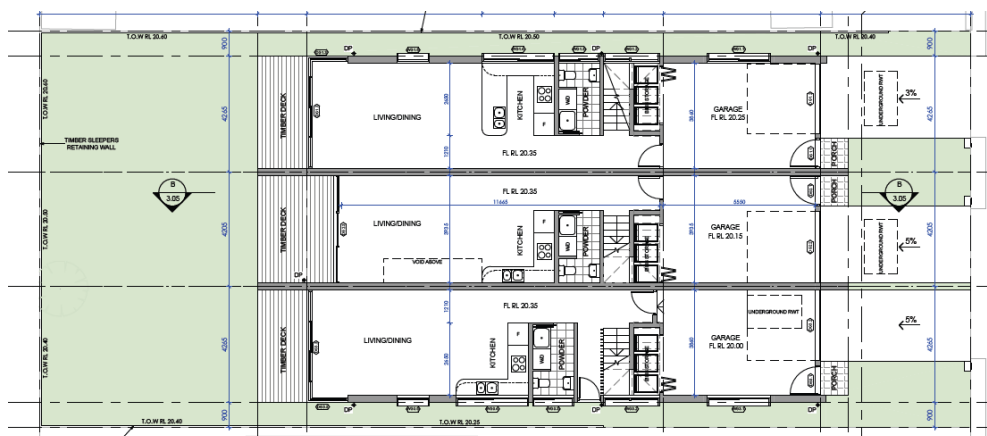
Ground floor plan as refused (Source: Bryan Long Group)
